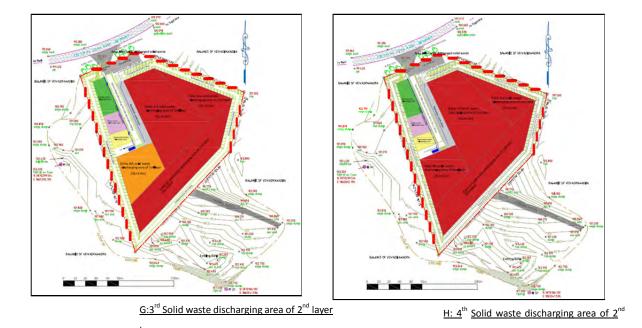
The 2nd layer solid waste filling plans of landfill site at Sigatoka Town
